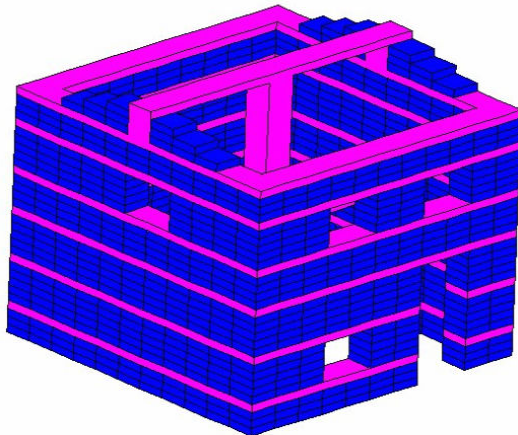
Mitigation of model 1 house with bond beams (Model 3)
